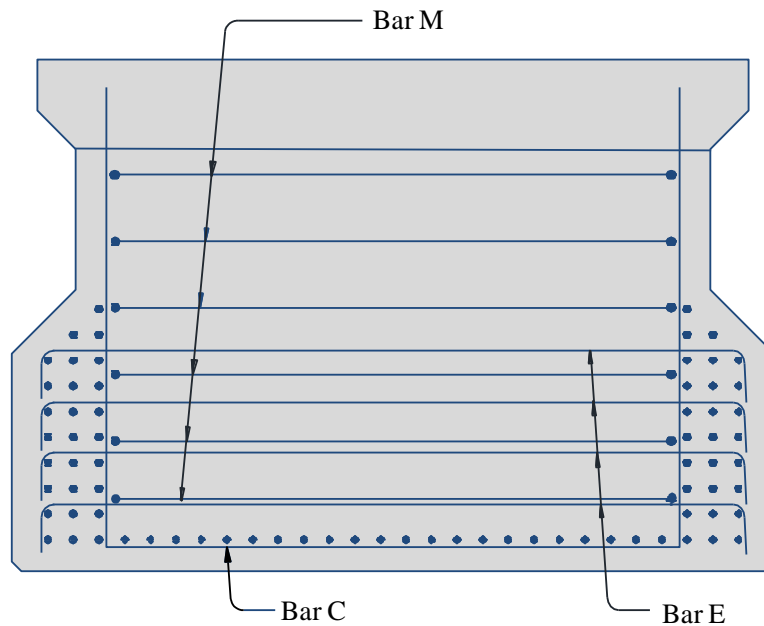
Horizontal Reinforcement in Phase I box beams.
